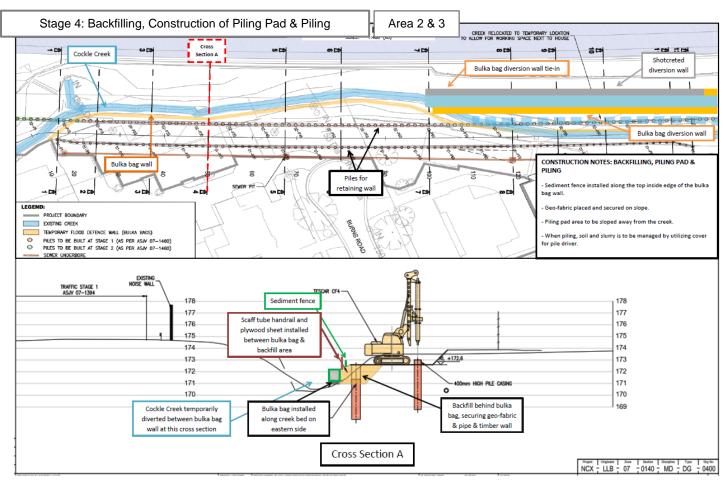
Extraction of ERSED Plan relation piling along Cockle Creek. Note the sediment fence was replaced with the installation of concrete poured behind the plywood fence to ensure no seepage through to the creek
